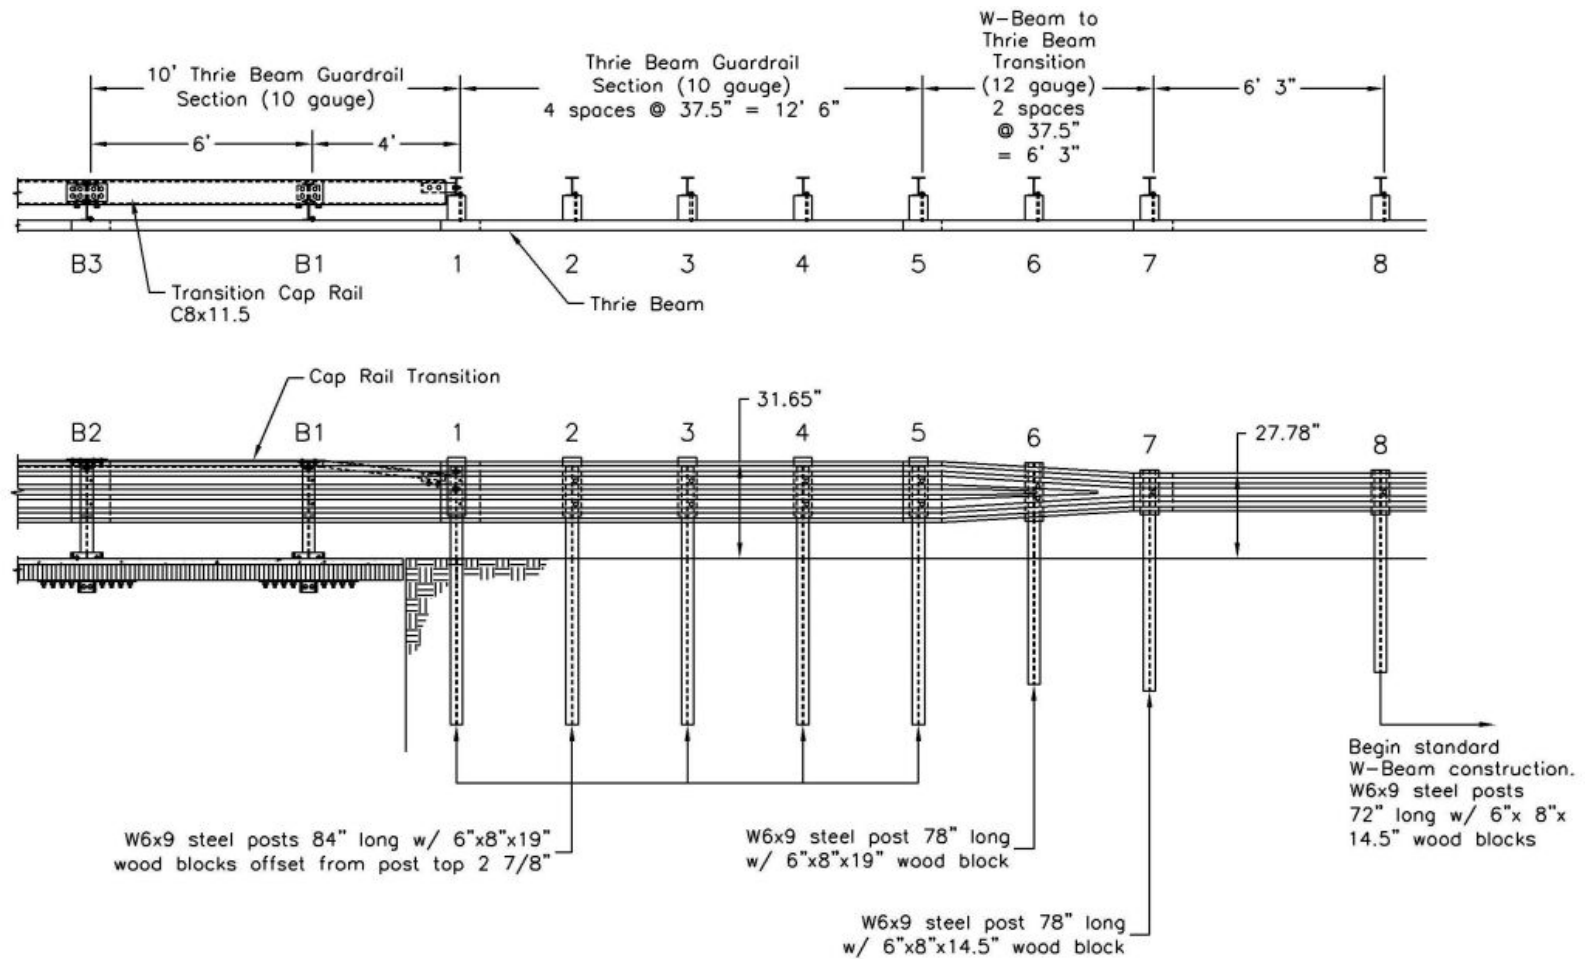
General Configuration of Approach Guardrail Transition System - Steel System
